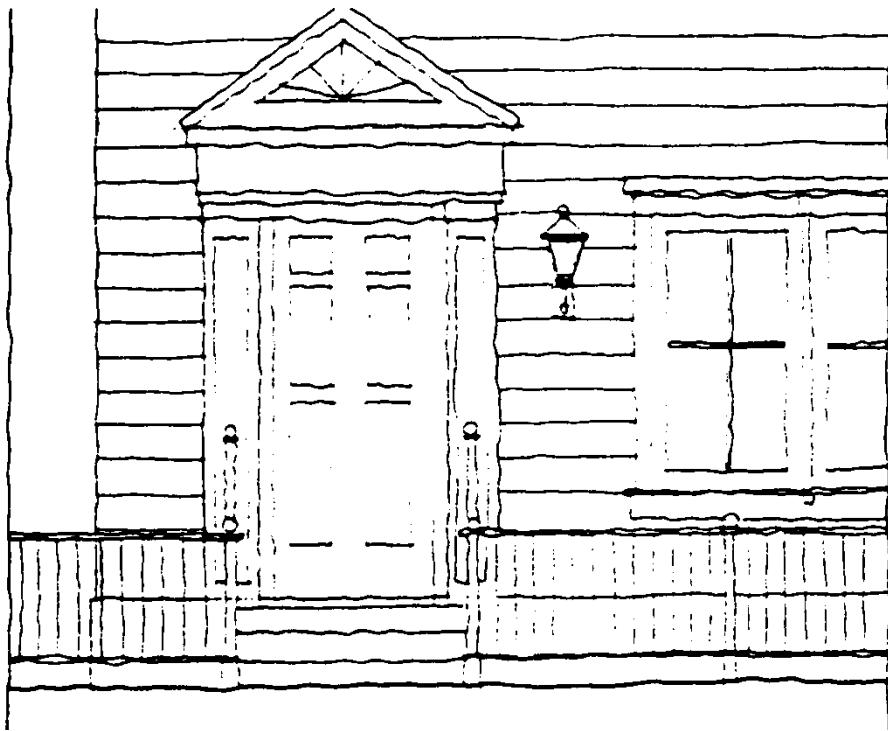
Entrances to buildings should be architecturally defined and articulated.
